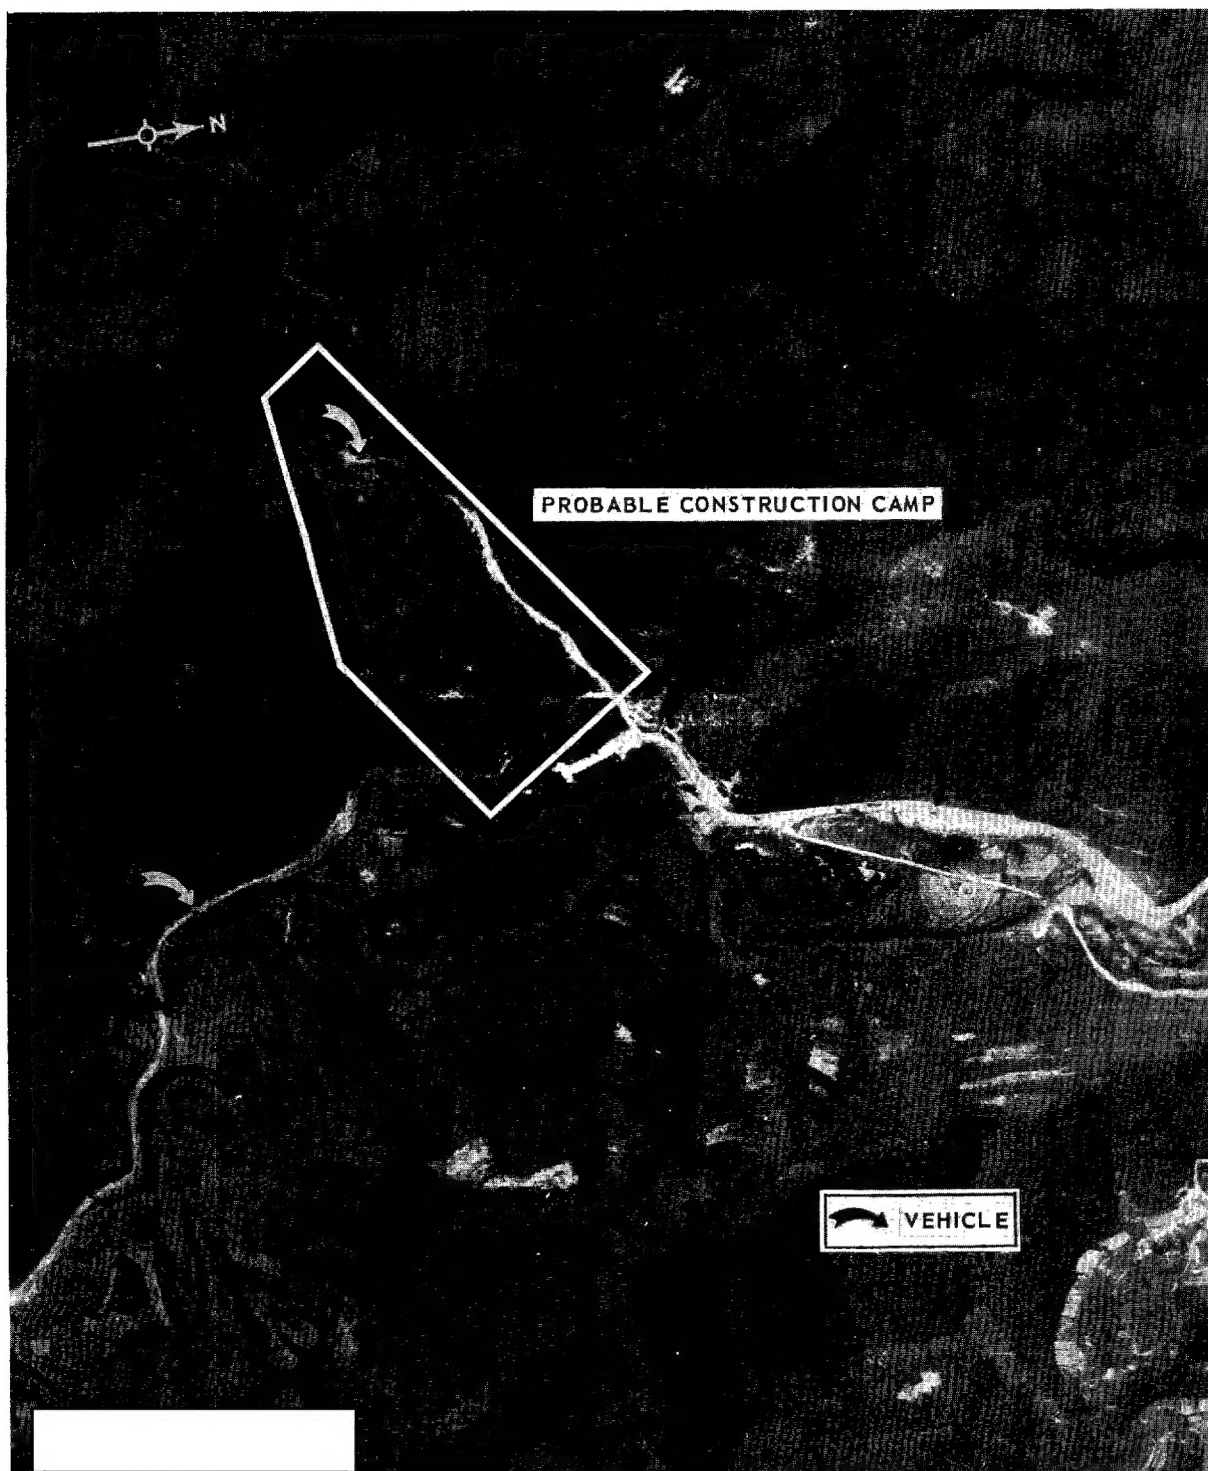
ROAD CONSTRUCTION, NORTH VIETNAM
